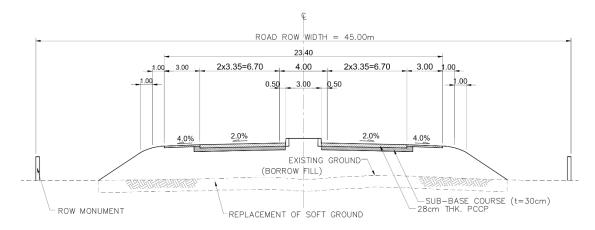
Typical Rodway Section for Lower Embankment At Ultimate (Permanent) Stage
